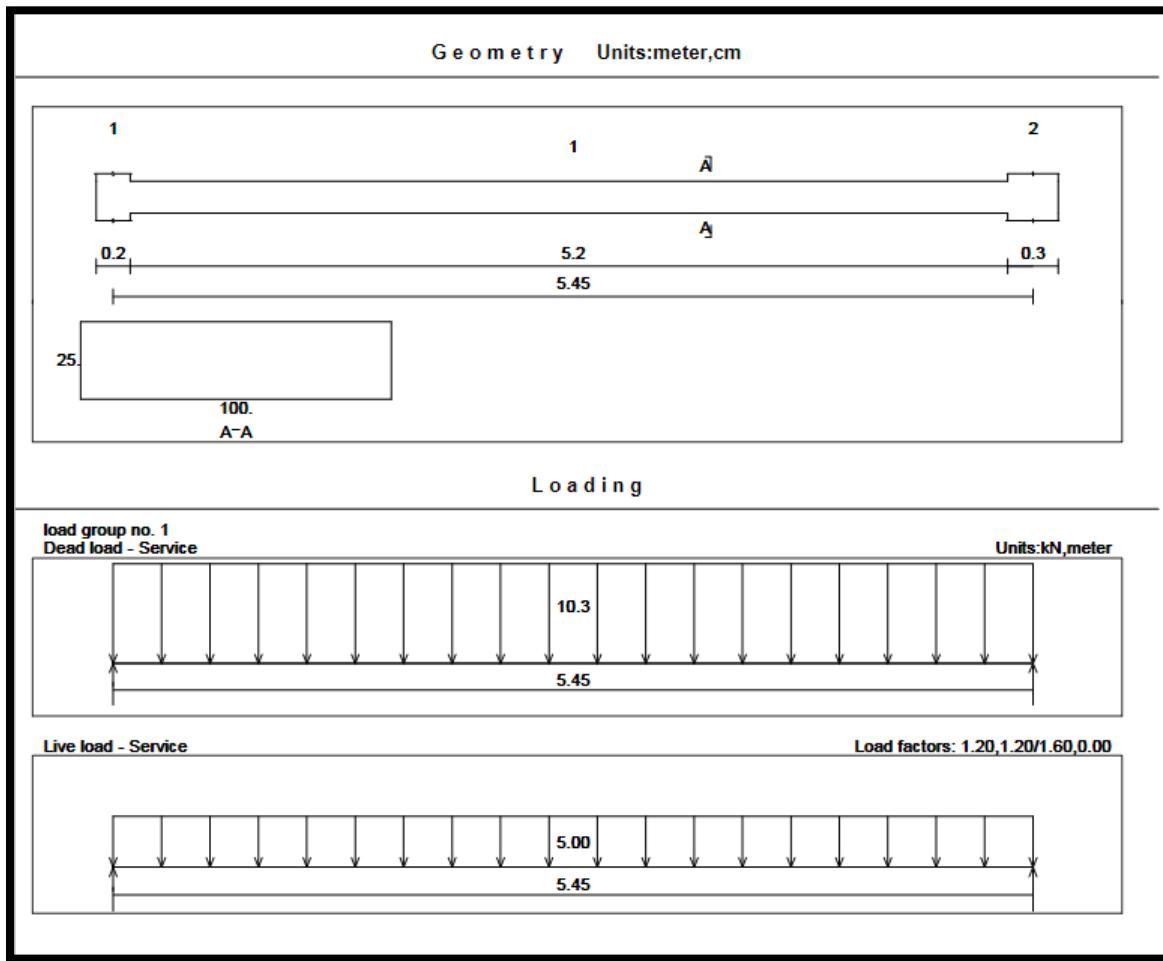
Statically System and Loads Distribution of Solid Slab(S1).
